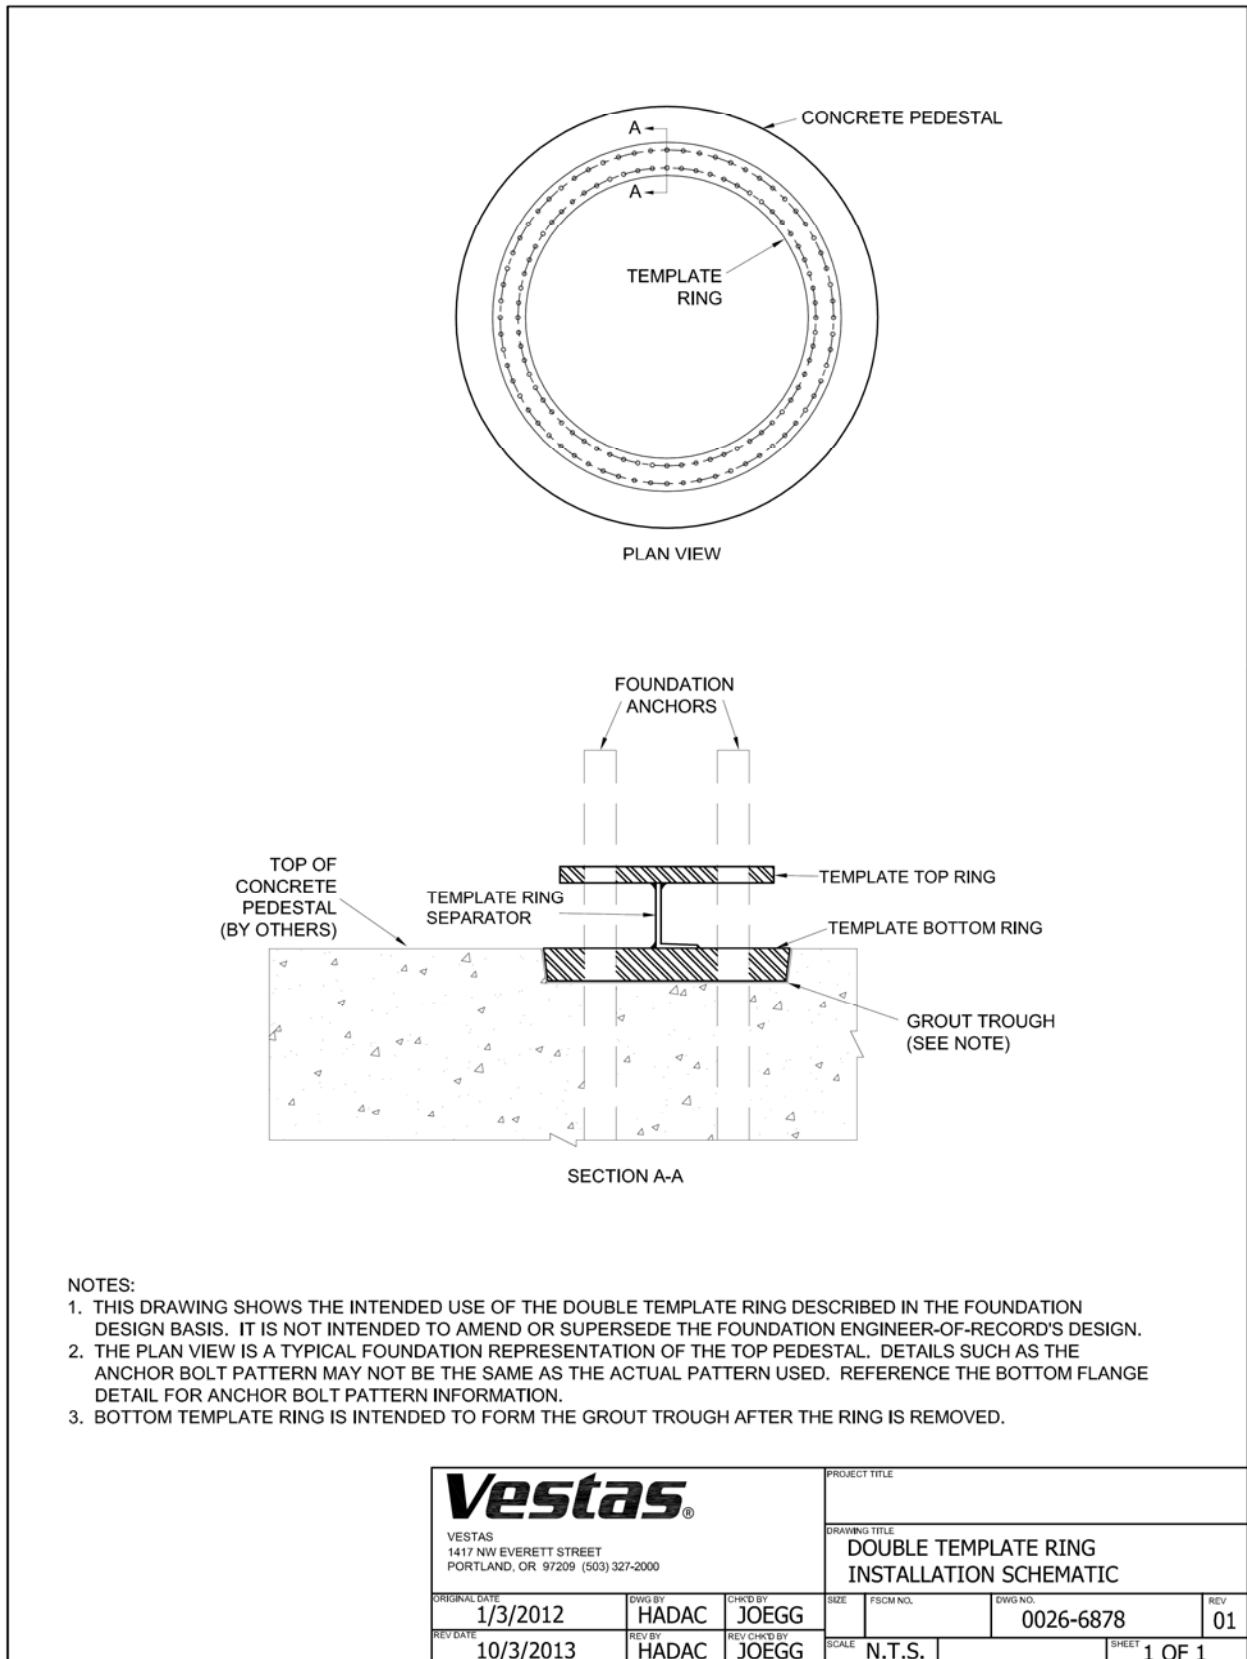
Tower Foundation Bolt Template Ring Installation Schematic
